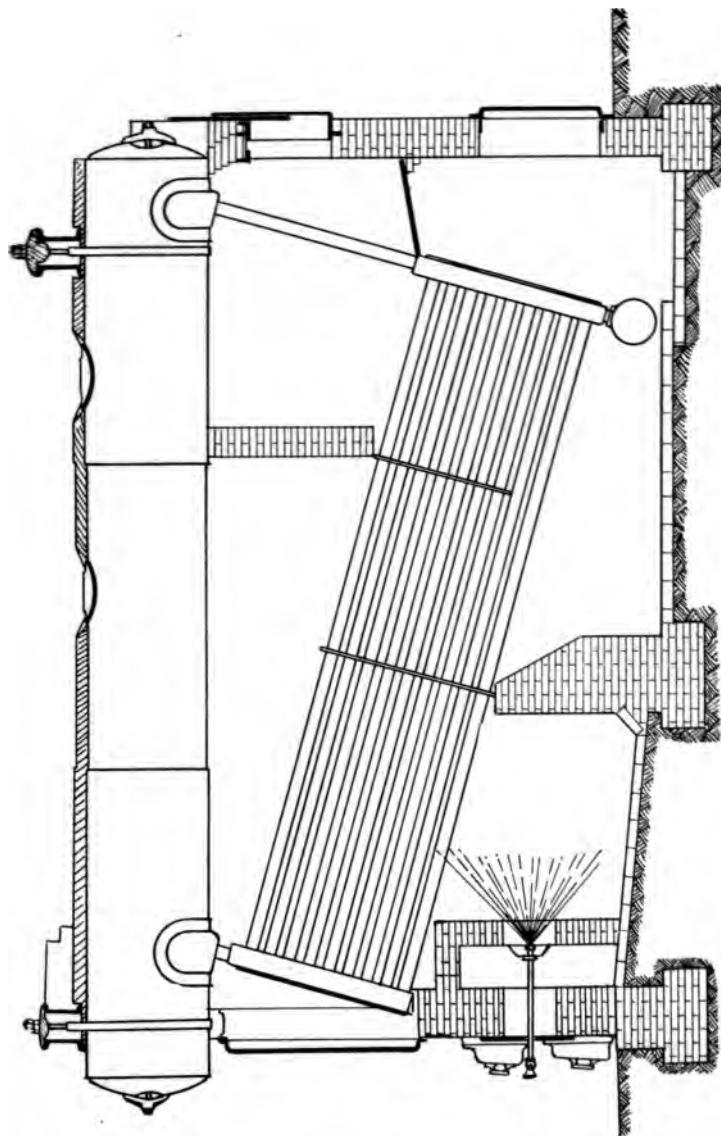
Arrangement of Furnace and Brickwork for Babcock & Wilcox Water Tube Boiler
